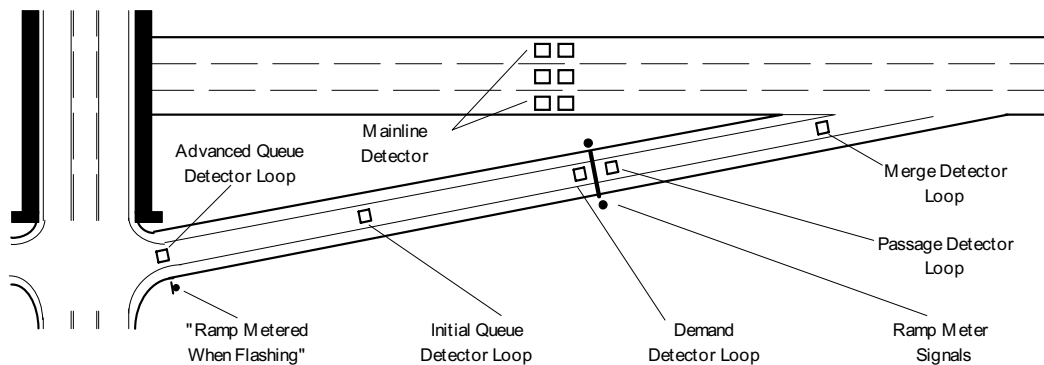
Typical Single-Lane Ramp Meter Configuration and Traffic Control Elements.
